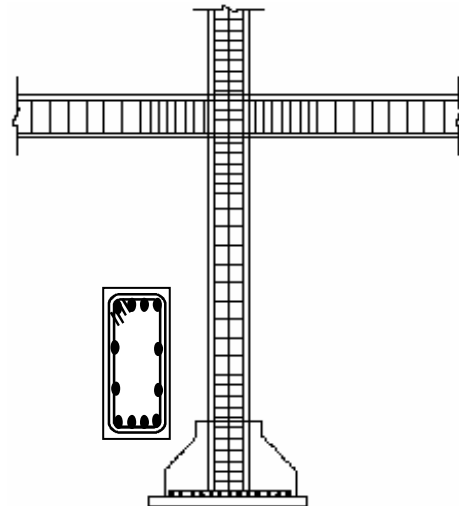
Detailing of C3 column as per IS 13920:1993
